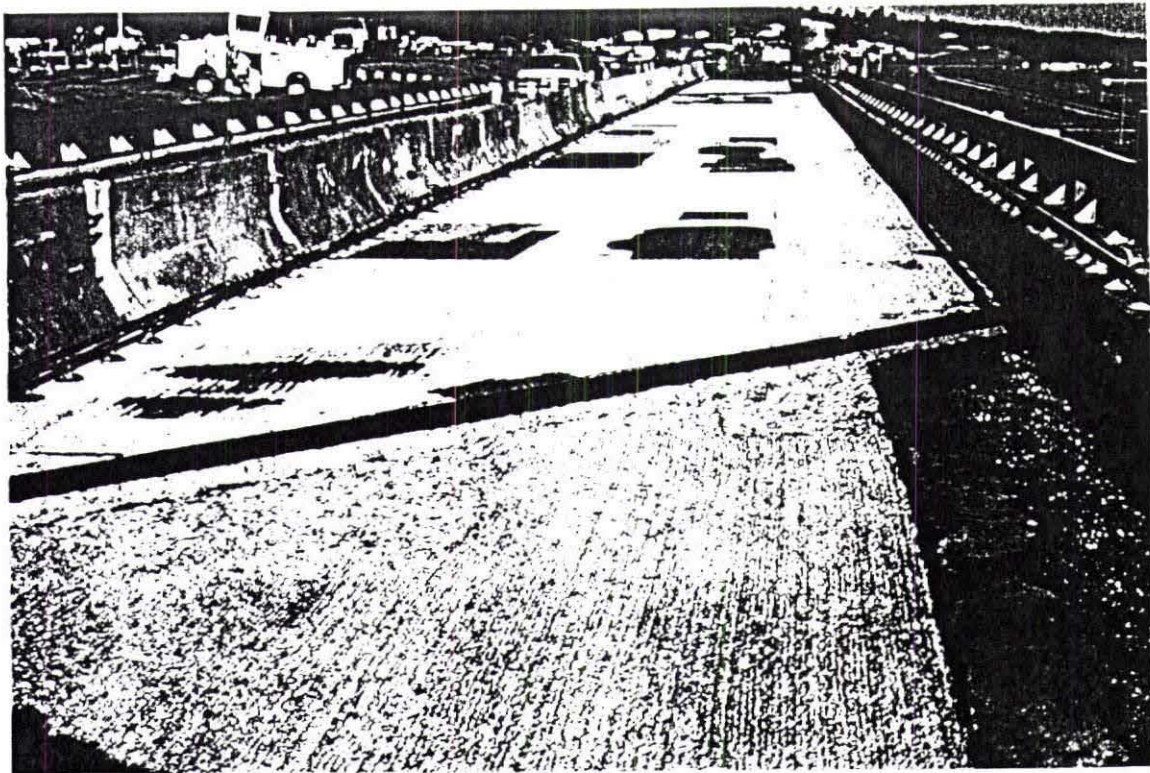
Maintenance Patches and Corroded Rebars
